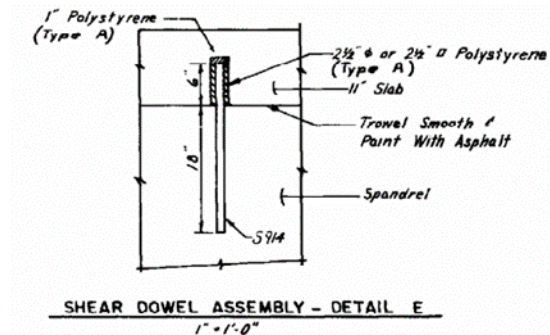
Detail of vertical dowels with foam surrounds, from 1980 plans.
